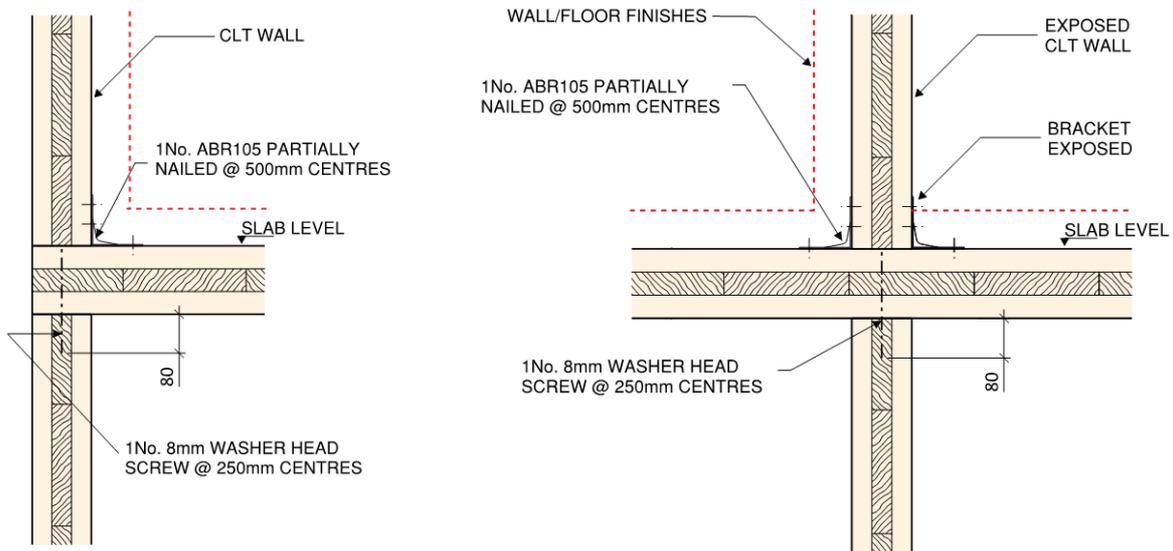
Typical detail of internal and external CLT wall to CLT floor.
